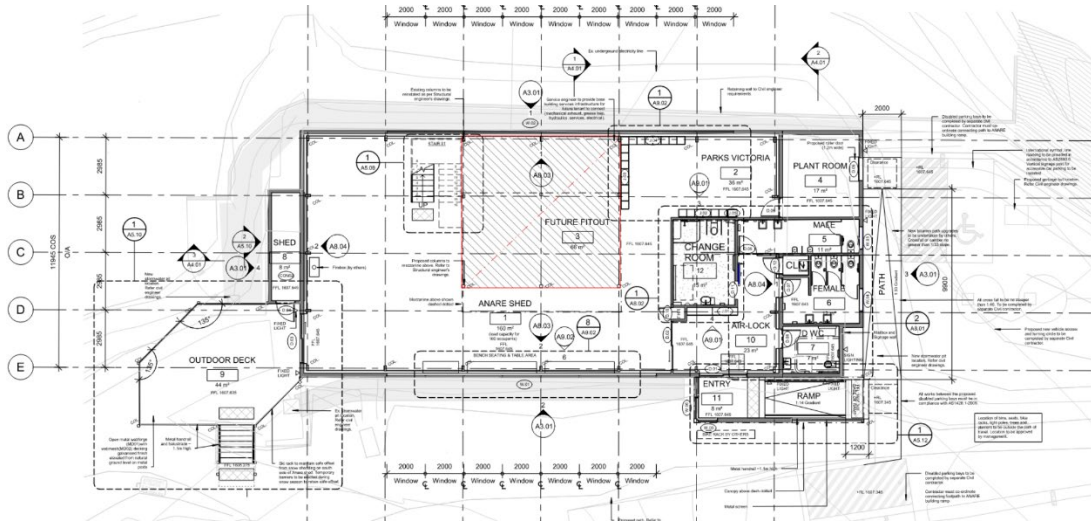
The proposed Ground Floor Plan, extracted from the advertised plans.
